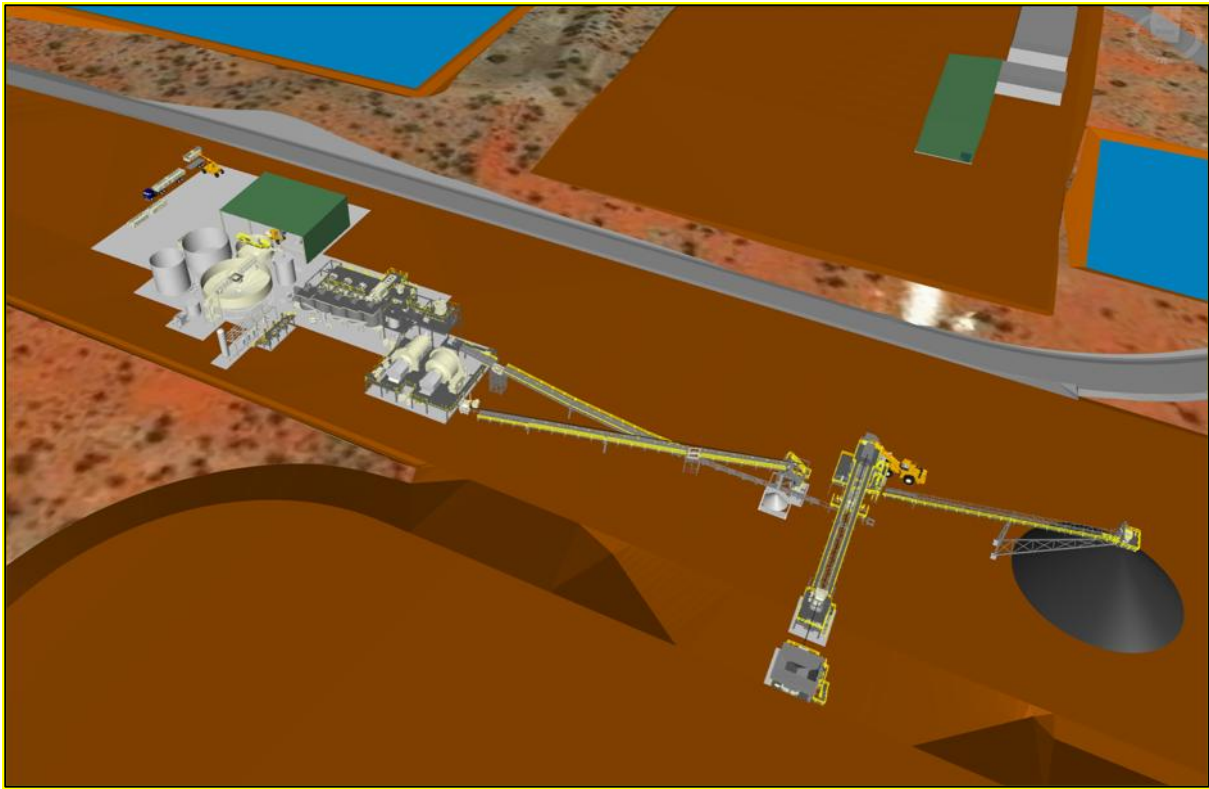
3D Process Plant Layout Looking West from the RoM Stockpile.
